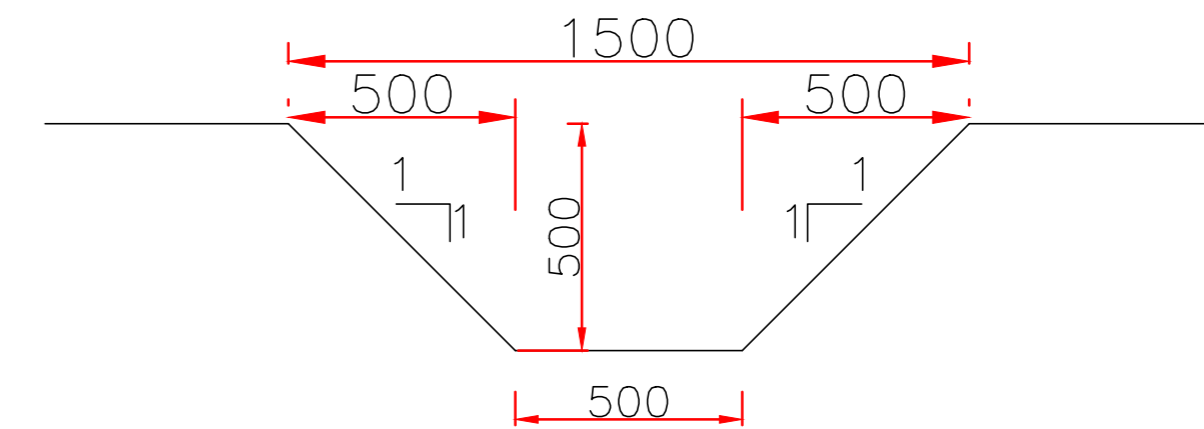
DETAILS OF DRAIN CROSS SECTION AT 2 LANE BUILT UP SECTION (SCALE 1:25)
